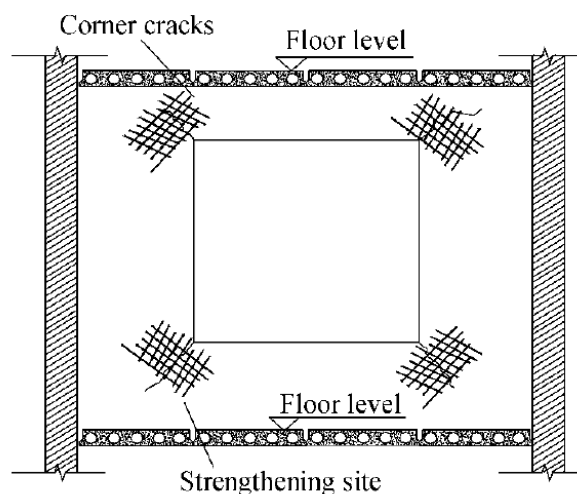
Retrofit on crack wall at corner of window with high-strength steel wire & polymer mortar
